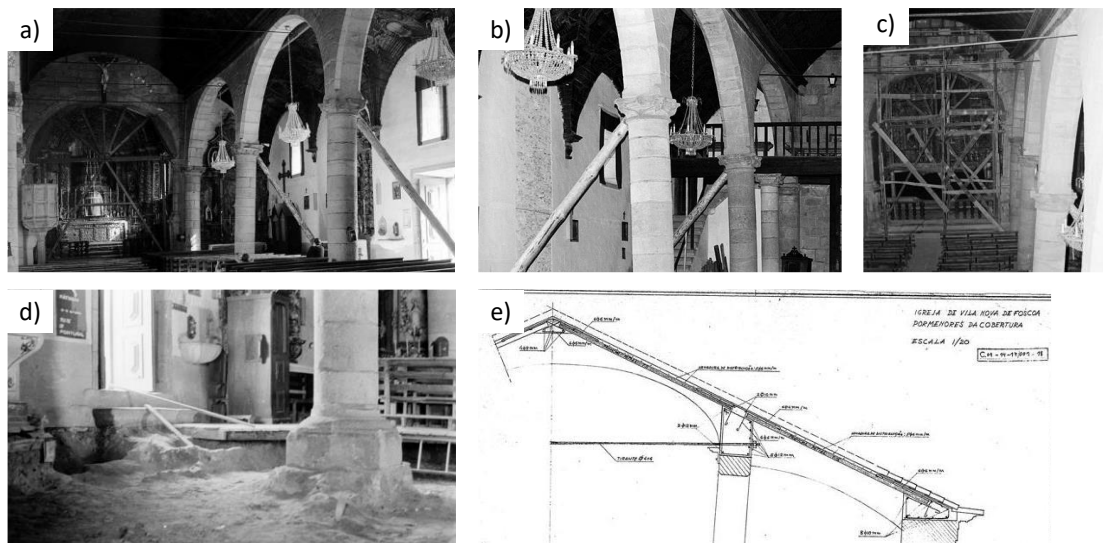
Main interventions carried out on Foz Côa Church in the 1970s: a) bracing of the Main Arch and columns, b) details of the columns bracing and c) details of the main arch bracing; d) inspection performed on foundations elements and e) detail of project of the reinforced concrete roof slab built [170].
